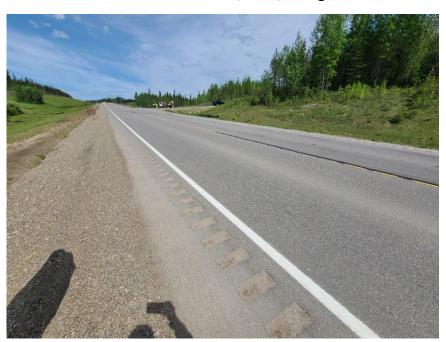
Settlement in pavement surface of Hwy 40:38 at GP038-I site at WP213. As well as rill erosion along south side of highway embankment. Photo taken June 15, 2022, facing southeast.
